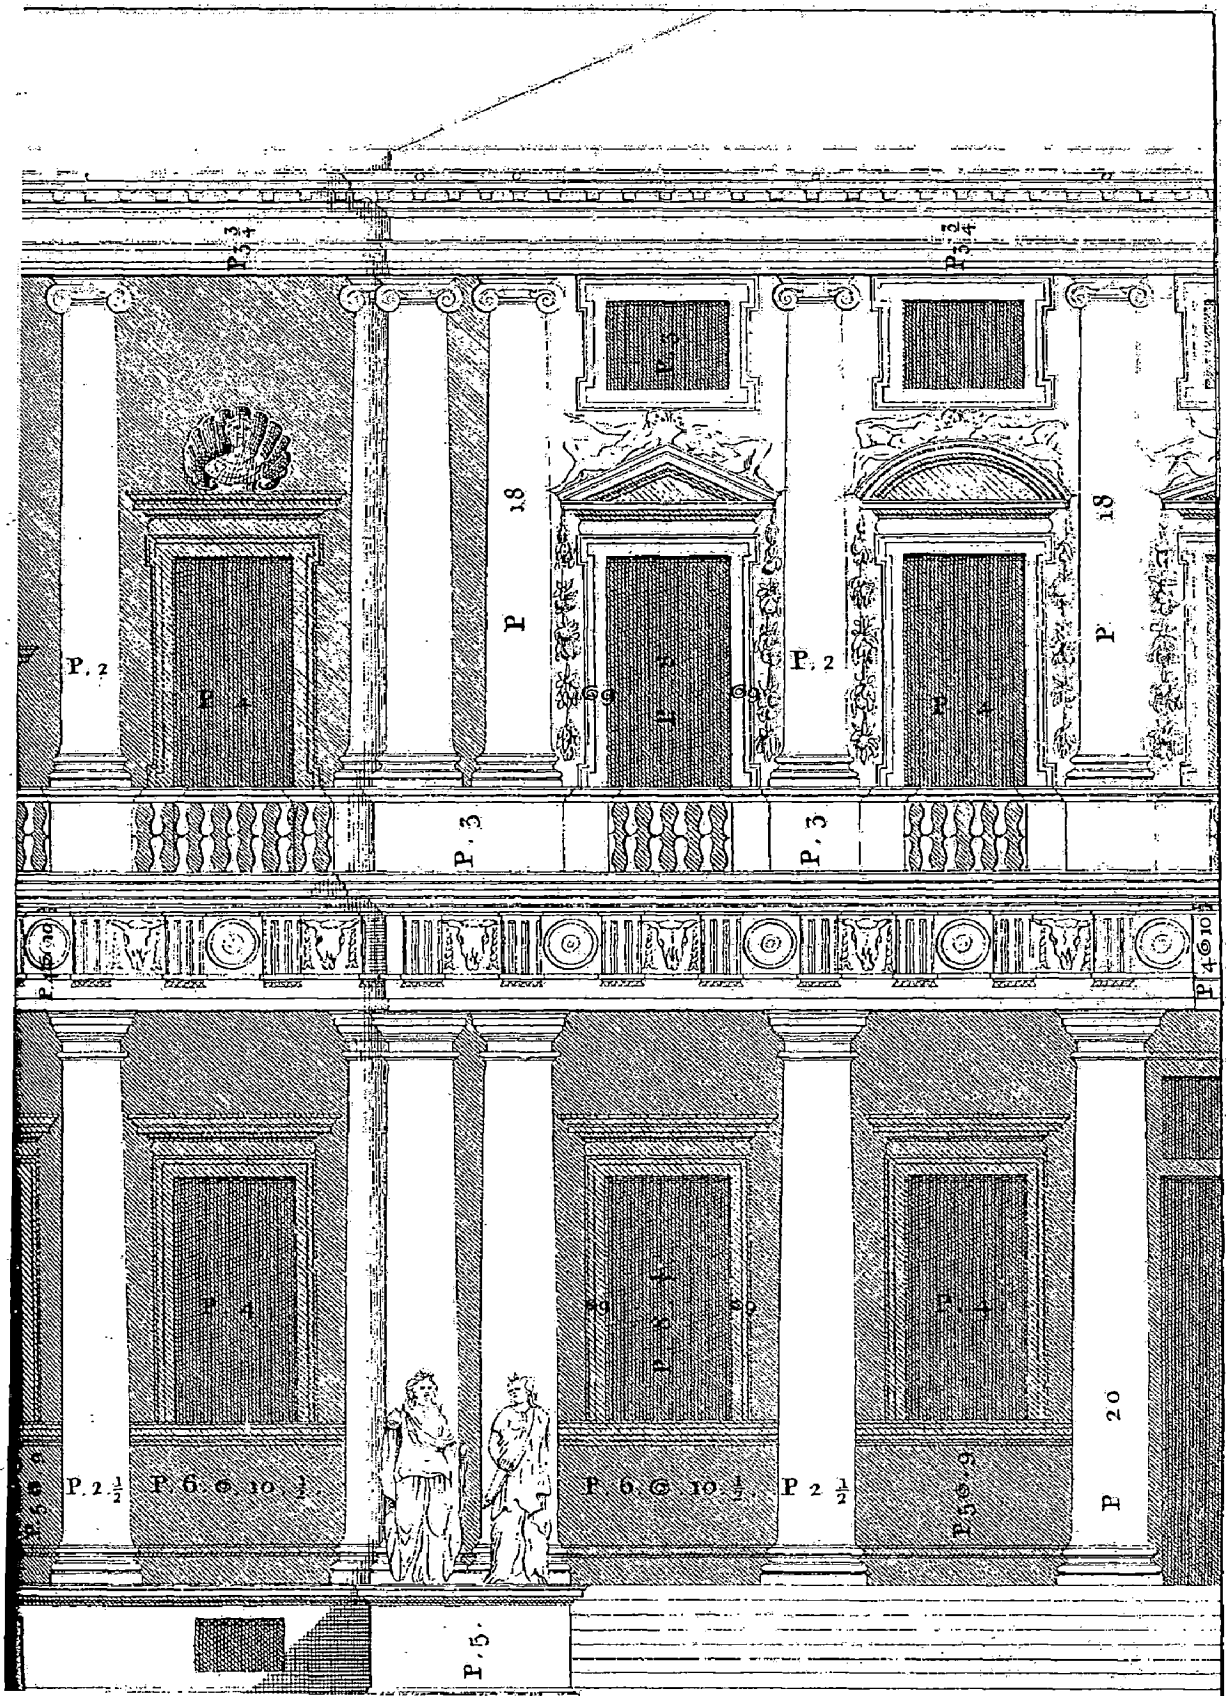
Palazzo Chierirati at Vicenza Part elevation of the facade
